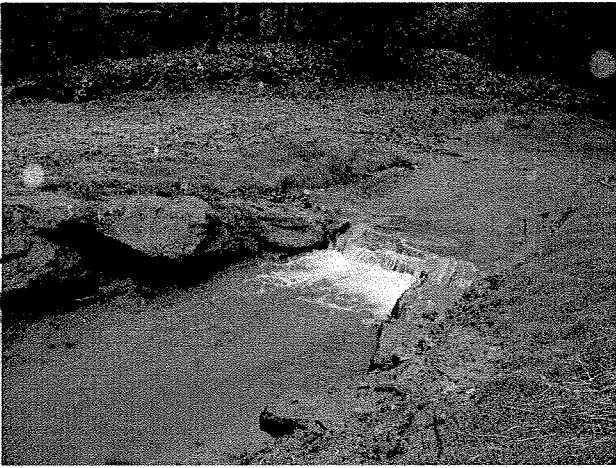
Gravel path installed at downstream end of main stem for cattle access to NC 18 culvert. (9/27/04)
